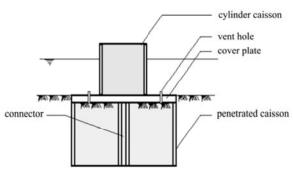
Cross section of the breakwater with penetrated caisson type substructure.
